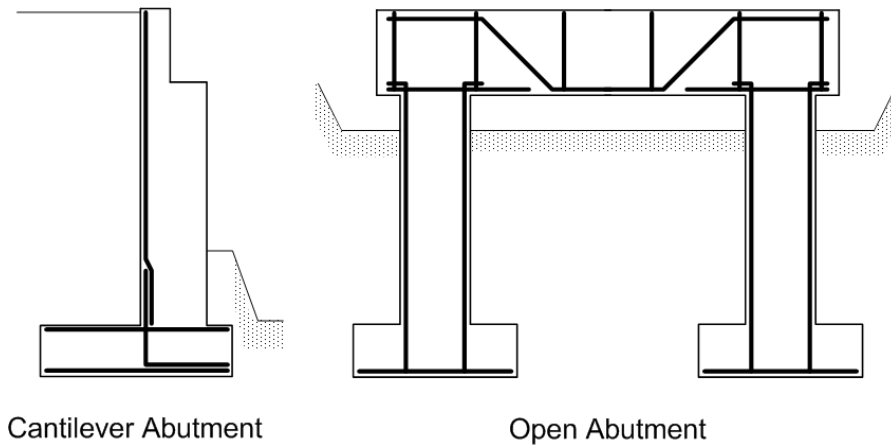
Primary Reinforcement in Concrete Abutments
